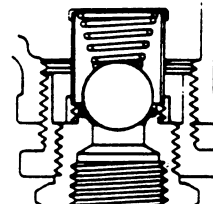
Vertical installation in bottom outlet of tee, showing use of reducing bushing.
